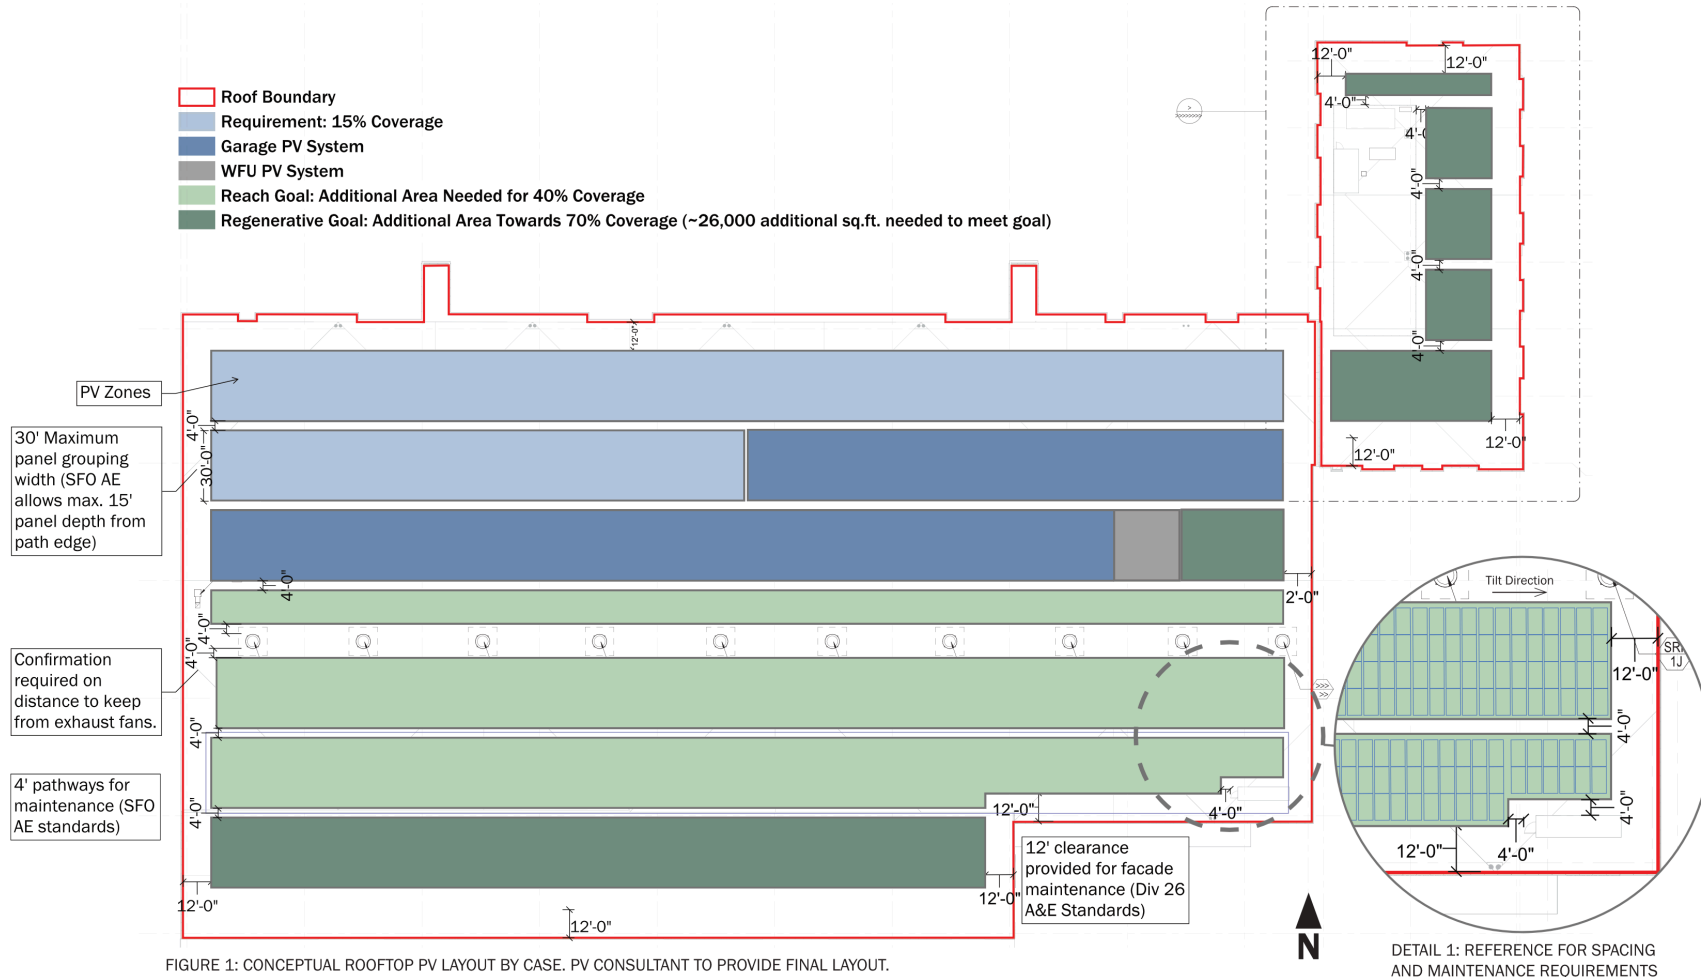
CONCEPTUAL ROOFTOP PV LAYOUT BY CASE. PV CONSULTANT TO PROVIDE FINAL LAYOUT.
